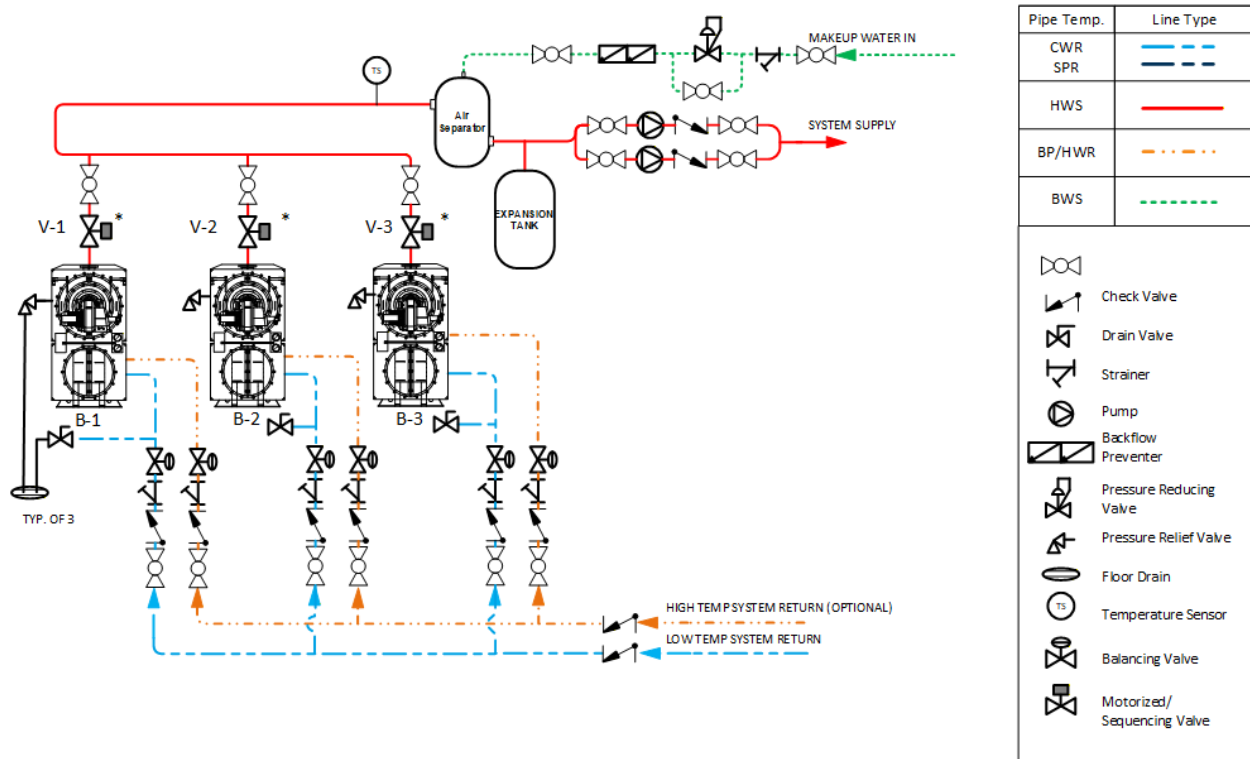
MFC II Boiler – Example of Water Piping Components
